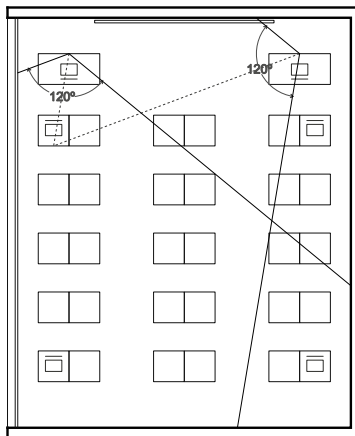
Sightlines and central visual field of the teacher, for the critical point of observation (looking at P2) when sitting in the window zone and when sitting in the wall zone.
